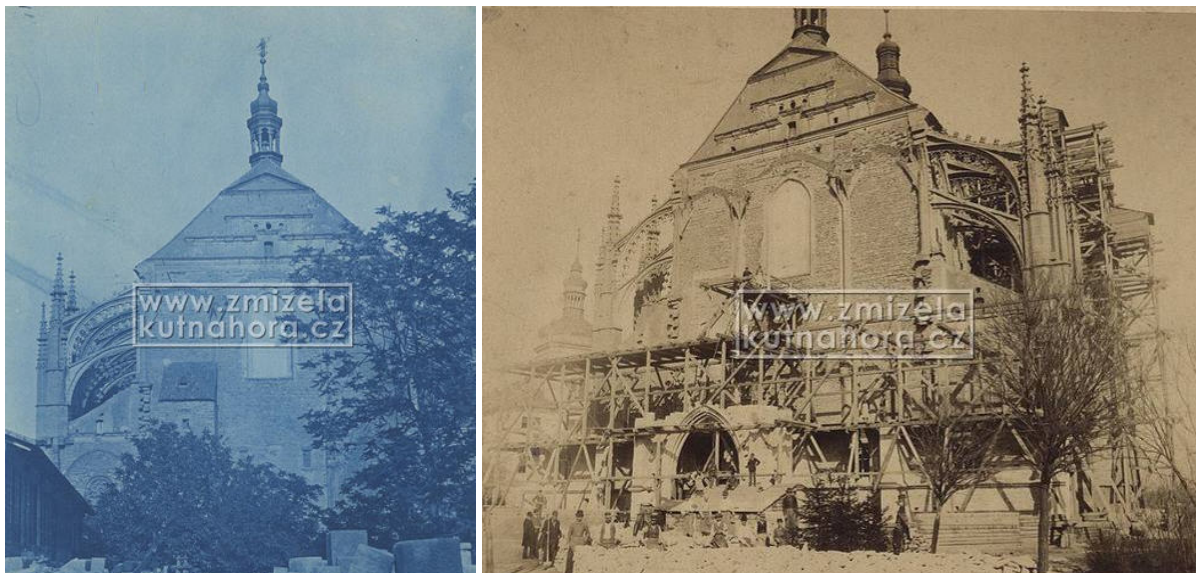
Temporary wall a) 1884 b) 1893 [19]
